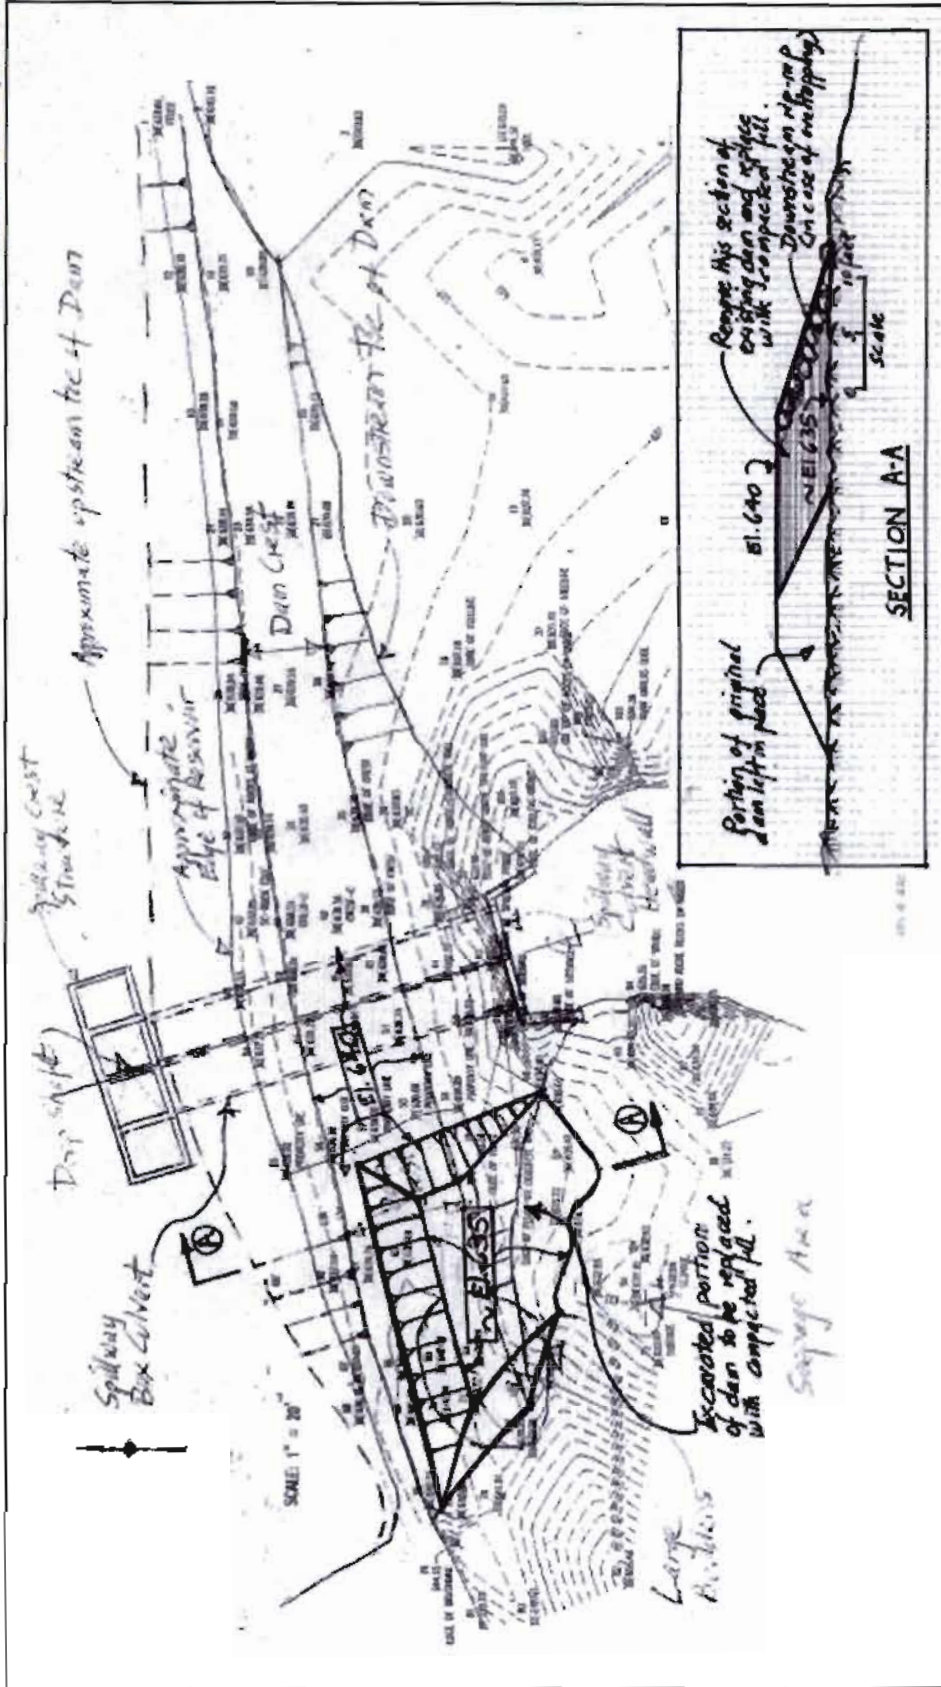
Reconstruction of Right Abutment Portion of the Dam
